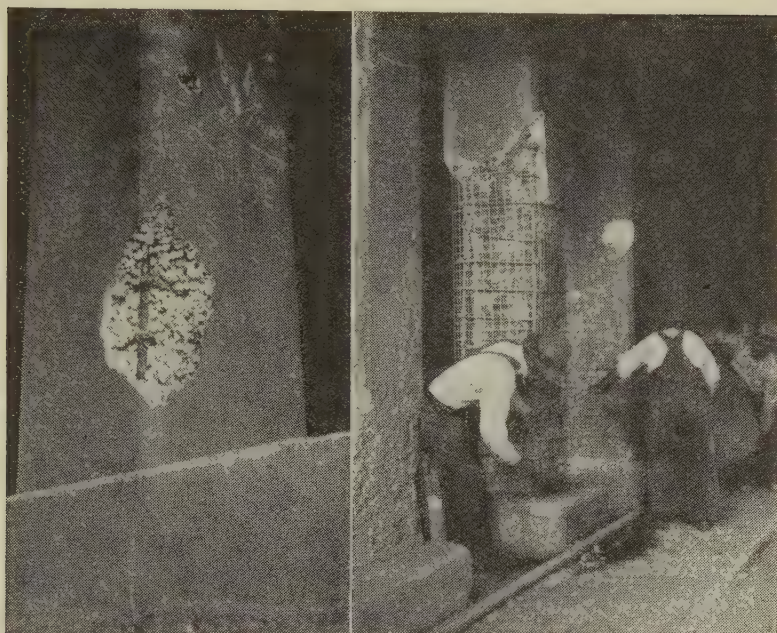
COLUMNS OF “CRACKERJACK” CONCRETE AND REINFORCING BARS OUT OF POSITION FINALLY HAD TO BE REPAIRED
